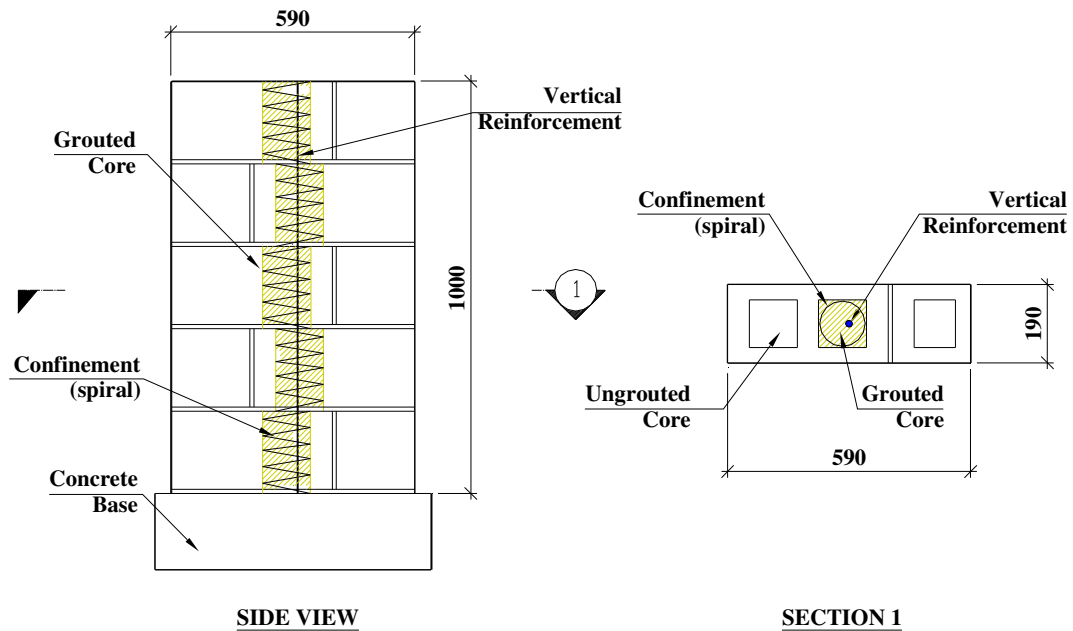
Reinforced and confined partially grouted concrete masonry wall specimen.
